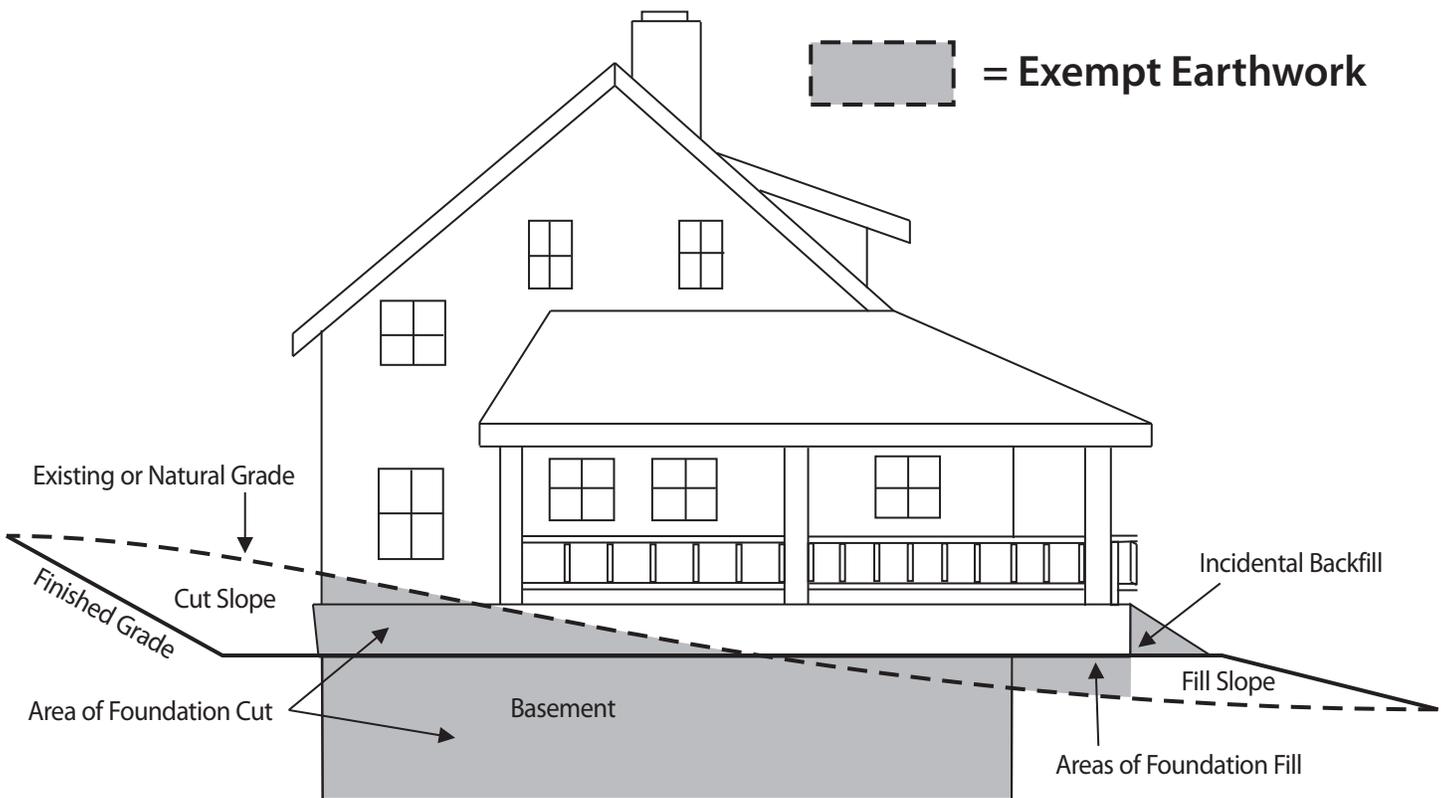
The diagram above illustrates which portions of a typical building pad are exempt.
